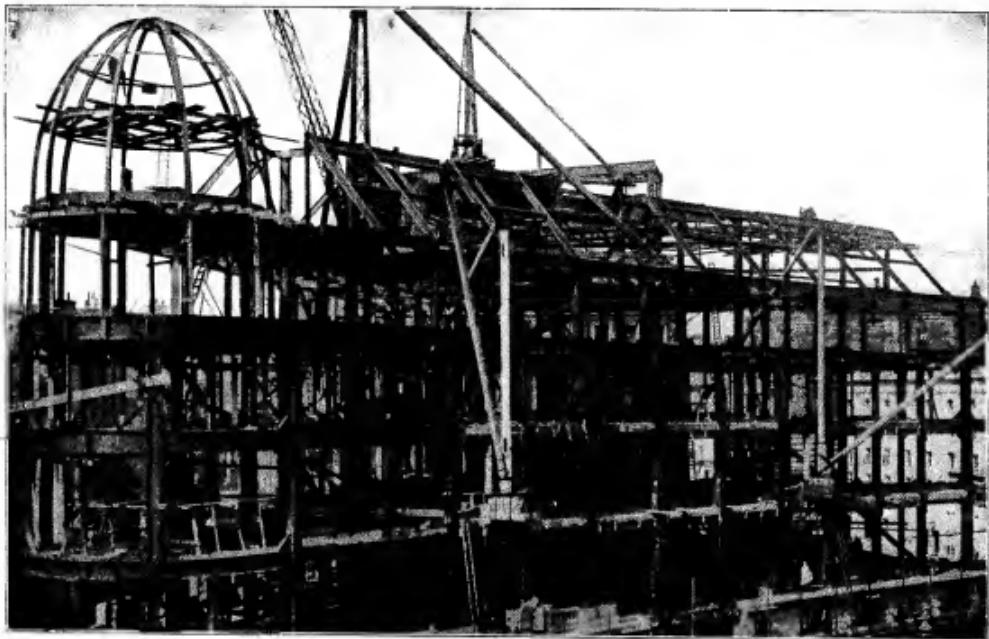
THE MORNING POST BUILDING, LONDON.
